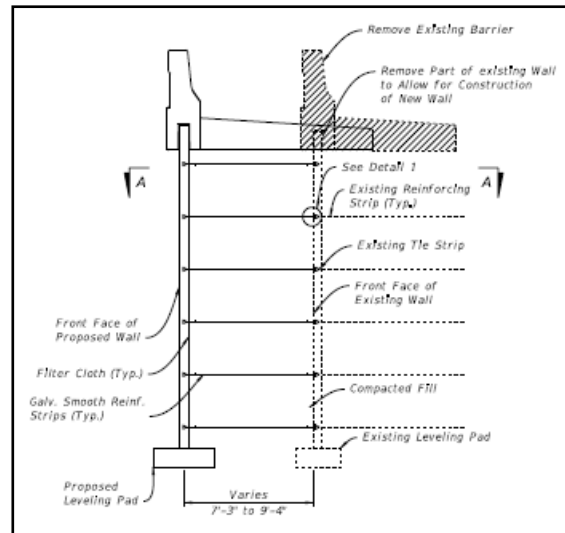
MSE Wall Widening by Direct Connection of Existing MSE Wall
